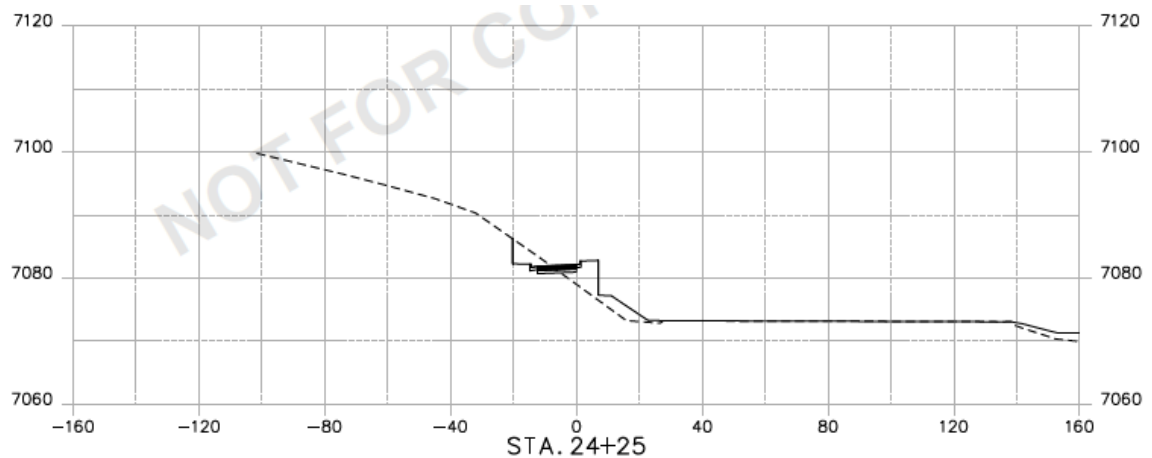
Typical cross-section of proposed cut and fill walls.
